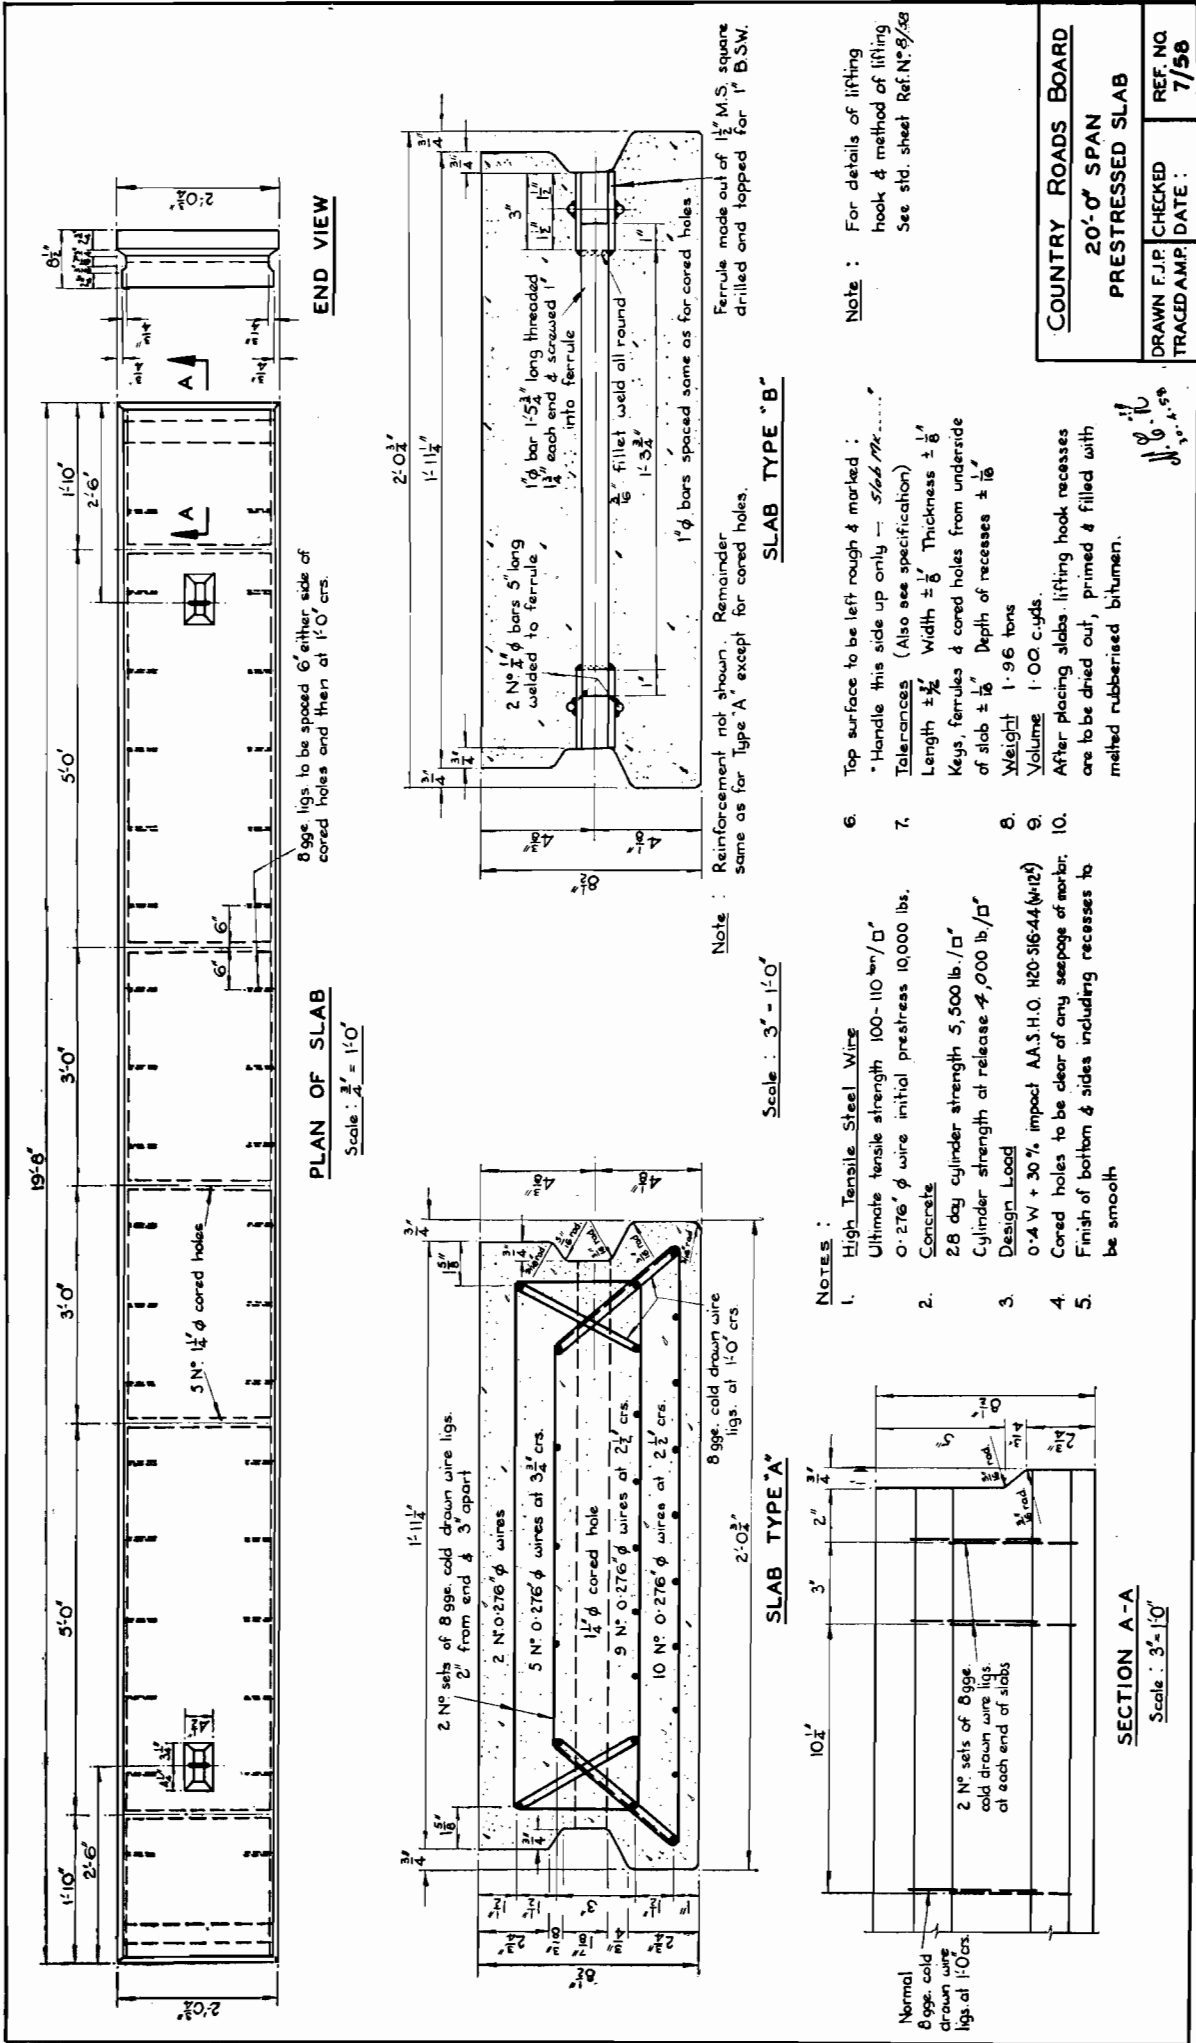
Details of 20ft. span pre-stressed reinforced concrete slab.
